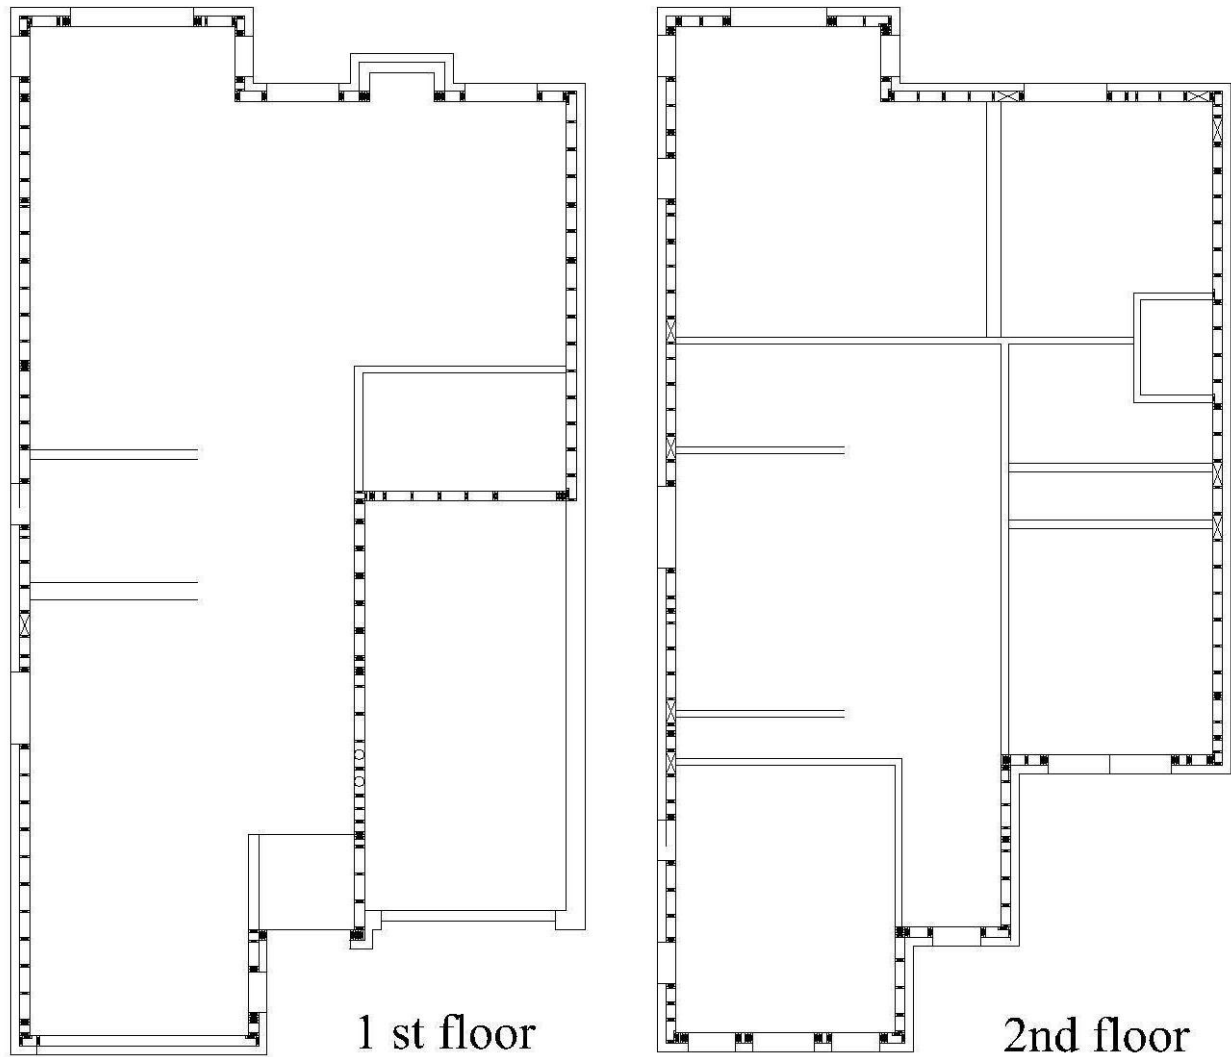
The first and the second floors for detached house (DH4) with the a built studs
